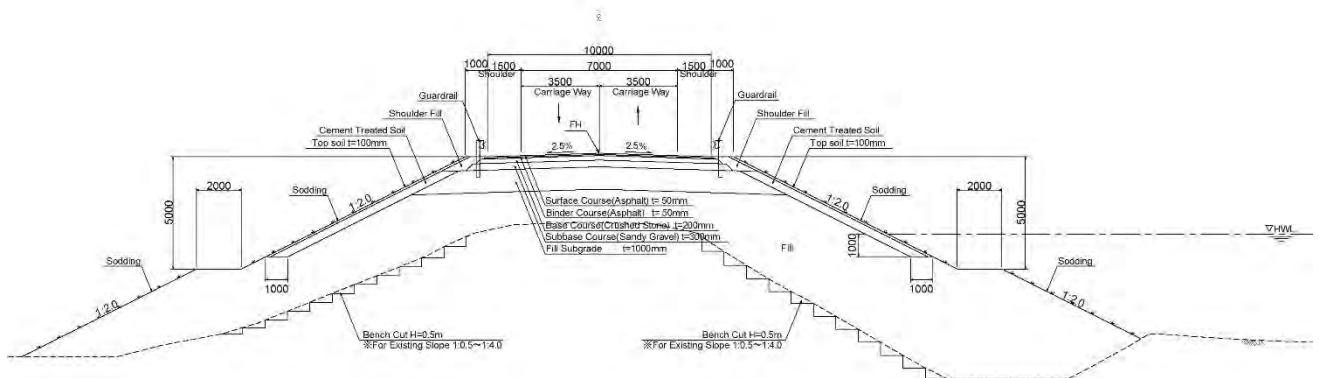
Typical Cross-section of Approach Road (Reconstruction at Existing Bridges)
